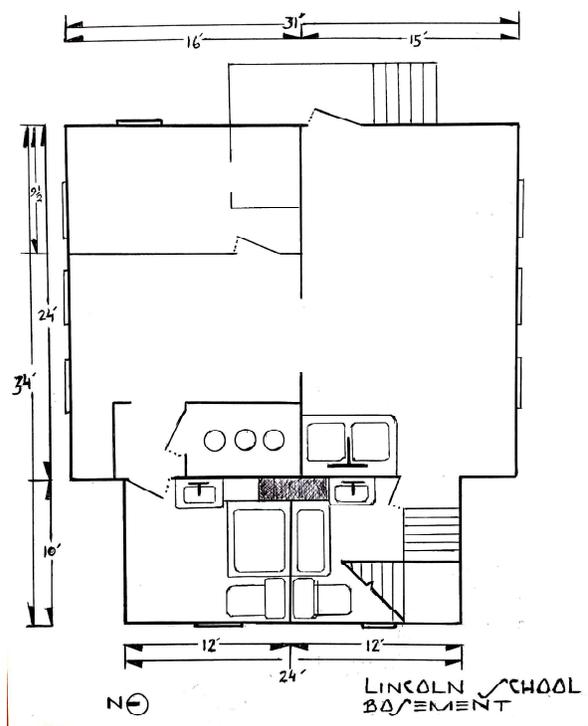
Figure F Current Plan. Lincoln School, Basement. Not to scale.
